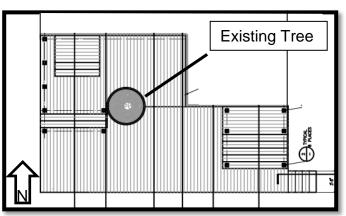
The floor plan of the proposed raised deck on the south elevation at the back of the house.
